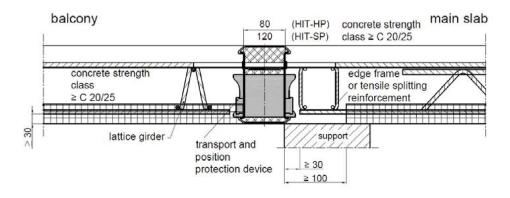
Example of the connection HIT-HP/SP MVX to element slabs with statically effective in-situ layer
